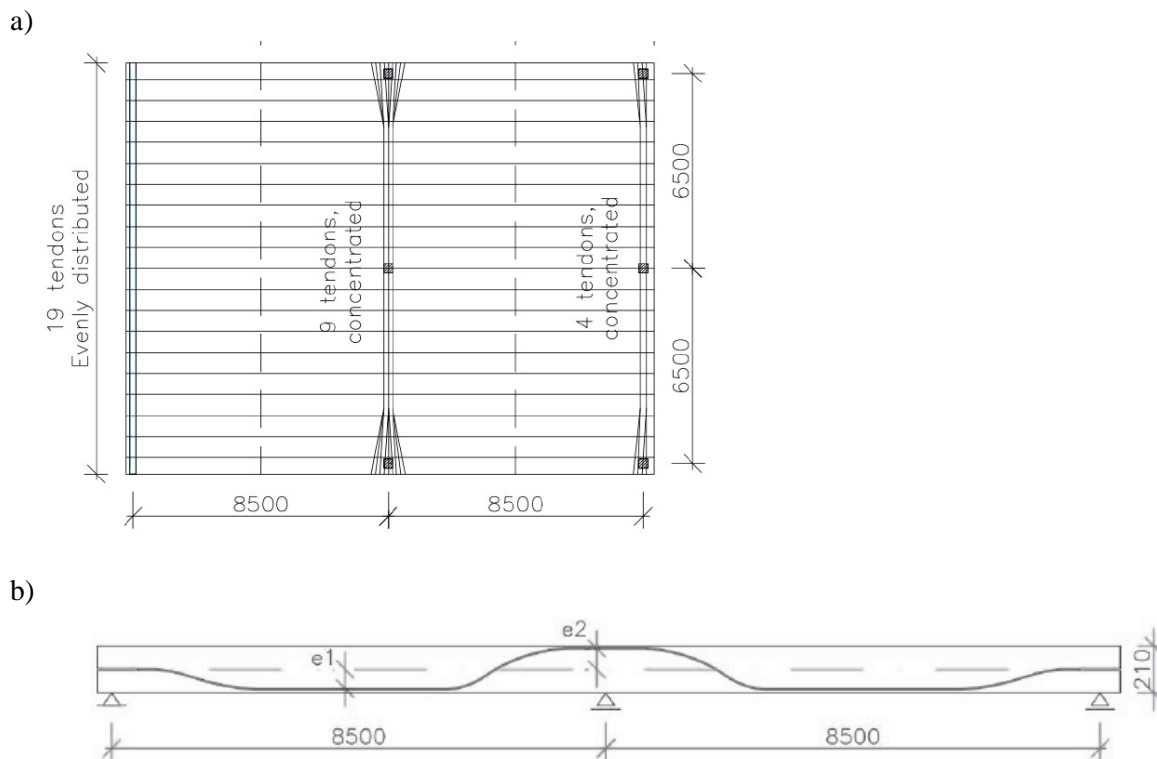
Structural system, geometry and tendon layout of the full-scale test-slab[3]
